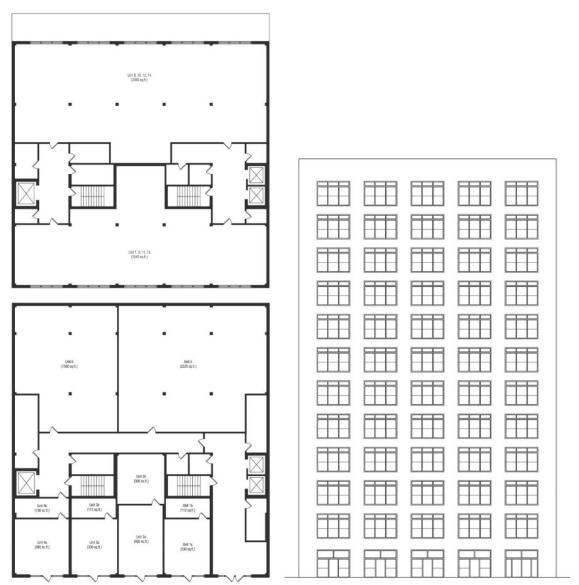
, 464, 465: (top left) Building 16, first (ground) floor (1914); (bottom left) floors 2-12 (1914); (right) street-front elevation (1973). 1"=32'. For plans, north is down.
